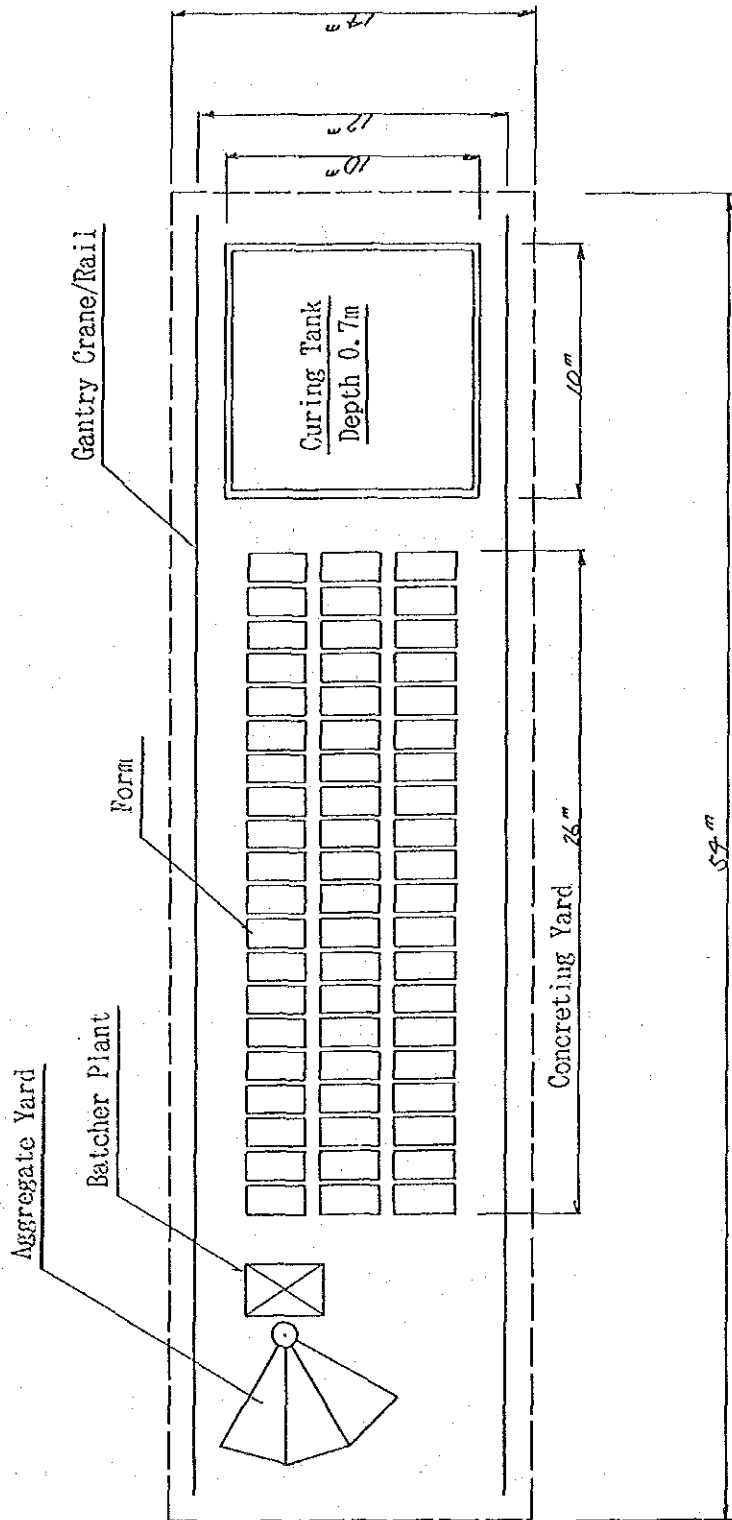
Fabrication Yards for Precasting Concrete Panels
